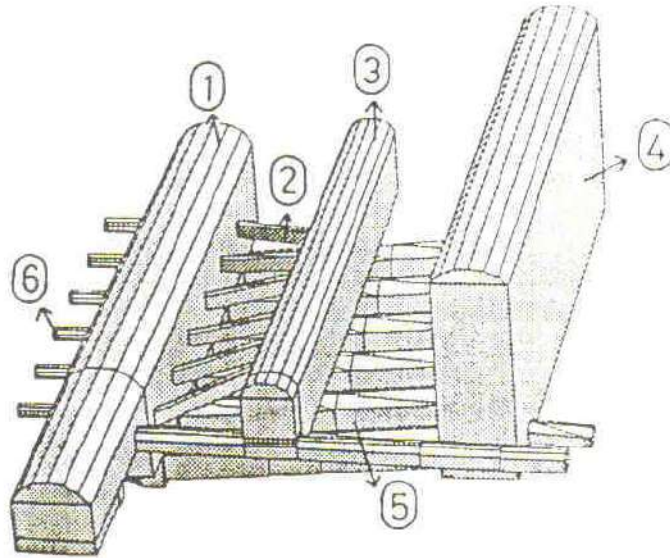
3D model of excavations of the Srisaïlam power house complex (see fig. 12)
